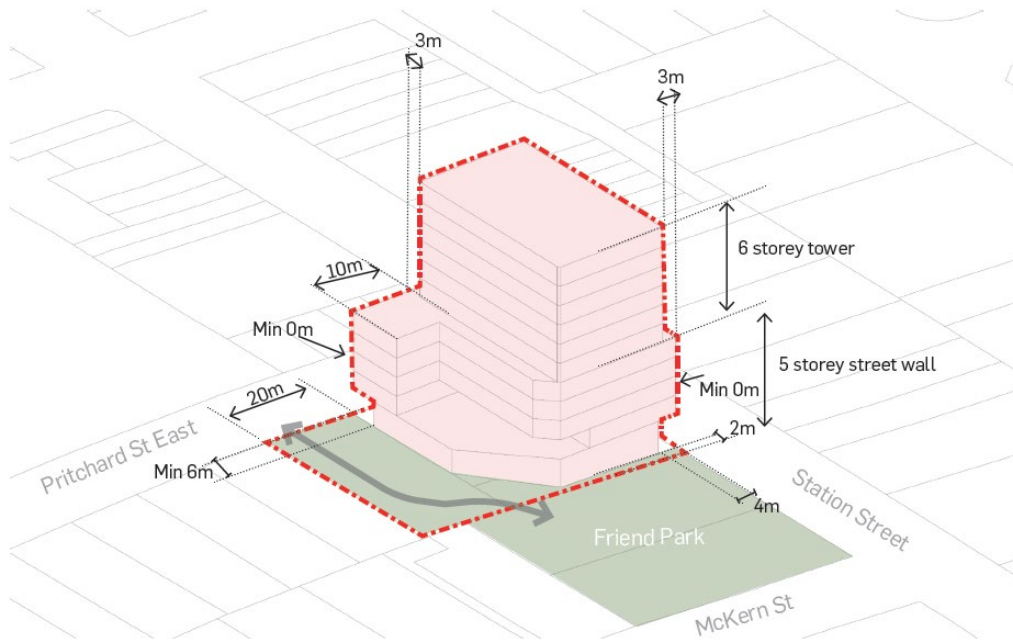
Corner of Pritchard Street and Station Street Precinct (3D Conceptual Diagram east – west section)
